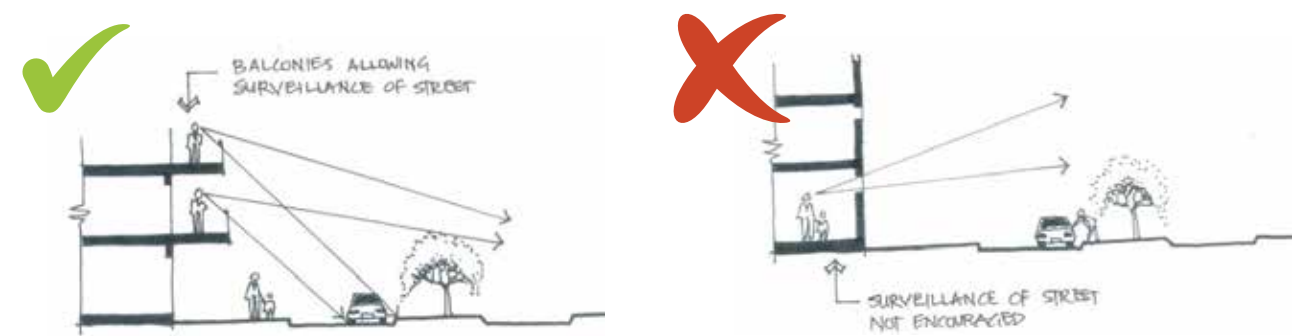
Balconies, windows and openings open onto the street or public open space and provide passive street surveillance
